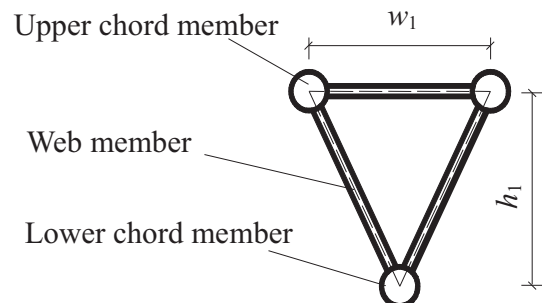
Cross section of the latticed 3D arches and the longitudinal latticed 3D beams.
